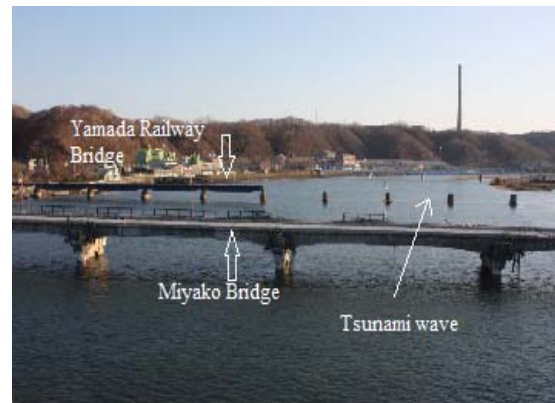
Damaged Miyako Bridge and Yamada Railway Bridge during Japan Tsunami
